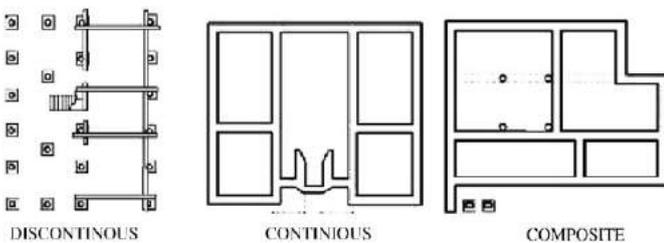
Schematic drawing of foundation types in a timber-framed structure [1].
